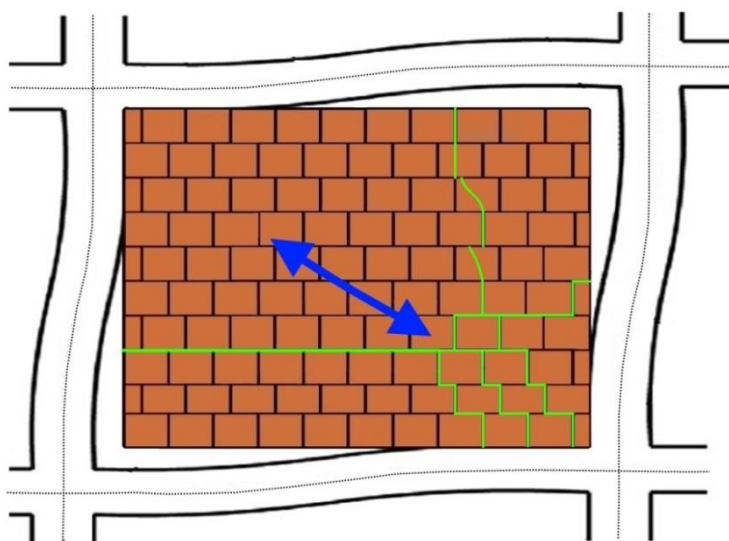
Deformation of the frame with the compressed diagonal, detachment and cracks occurred
